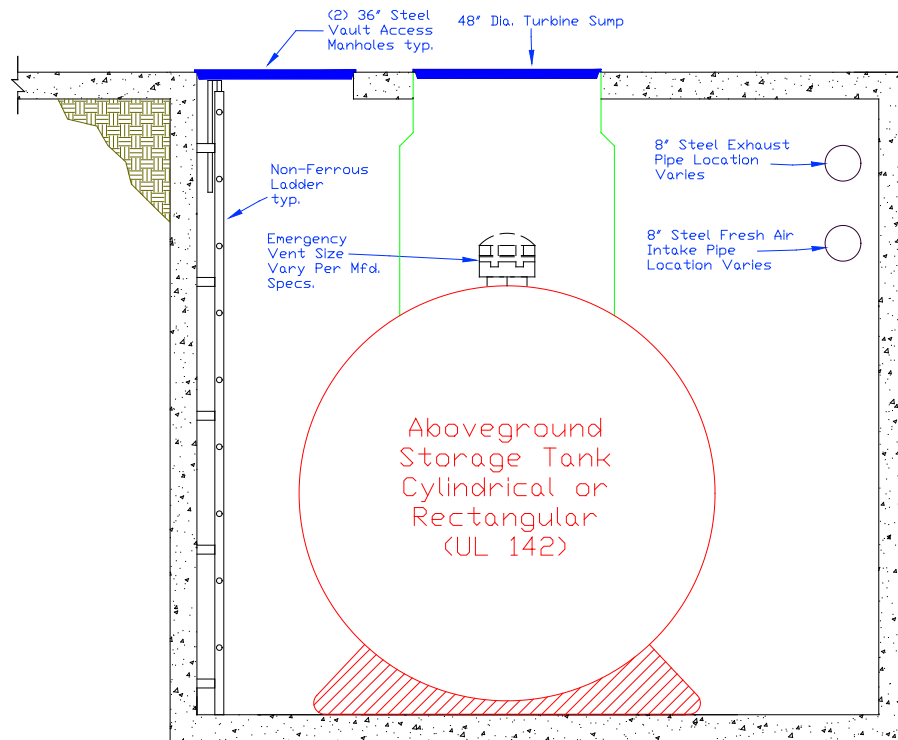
Front Sectional Views of Typical Vaulted AST
